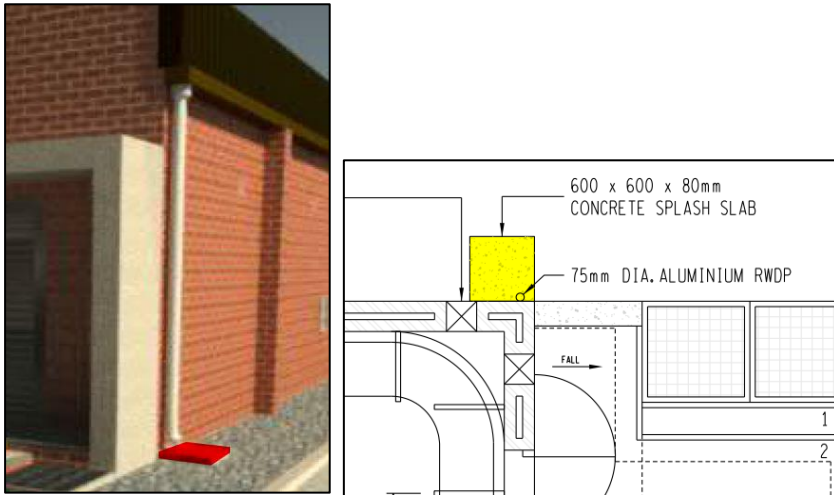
Perspective (left) and plan view (right) of concrete splash slab below rainwater downpipes.
